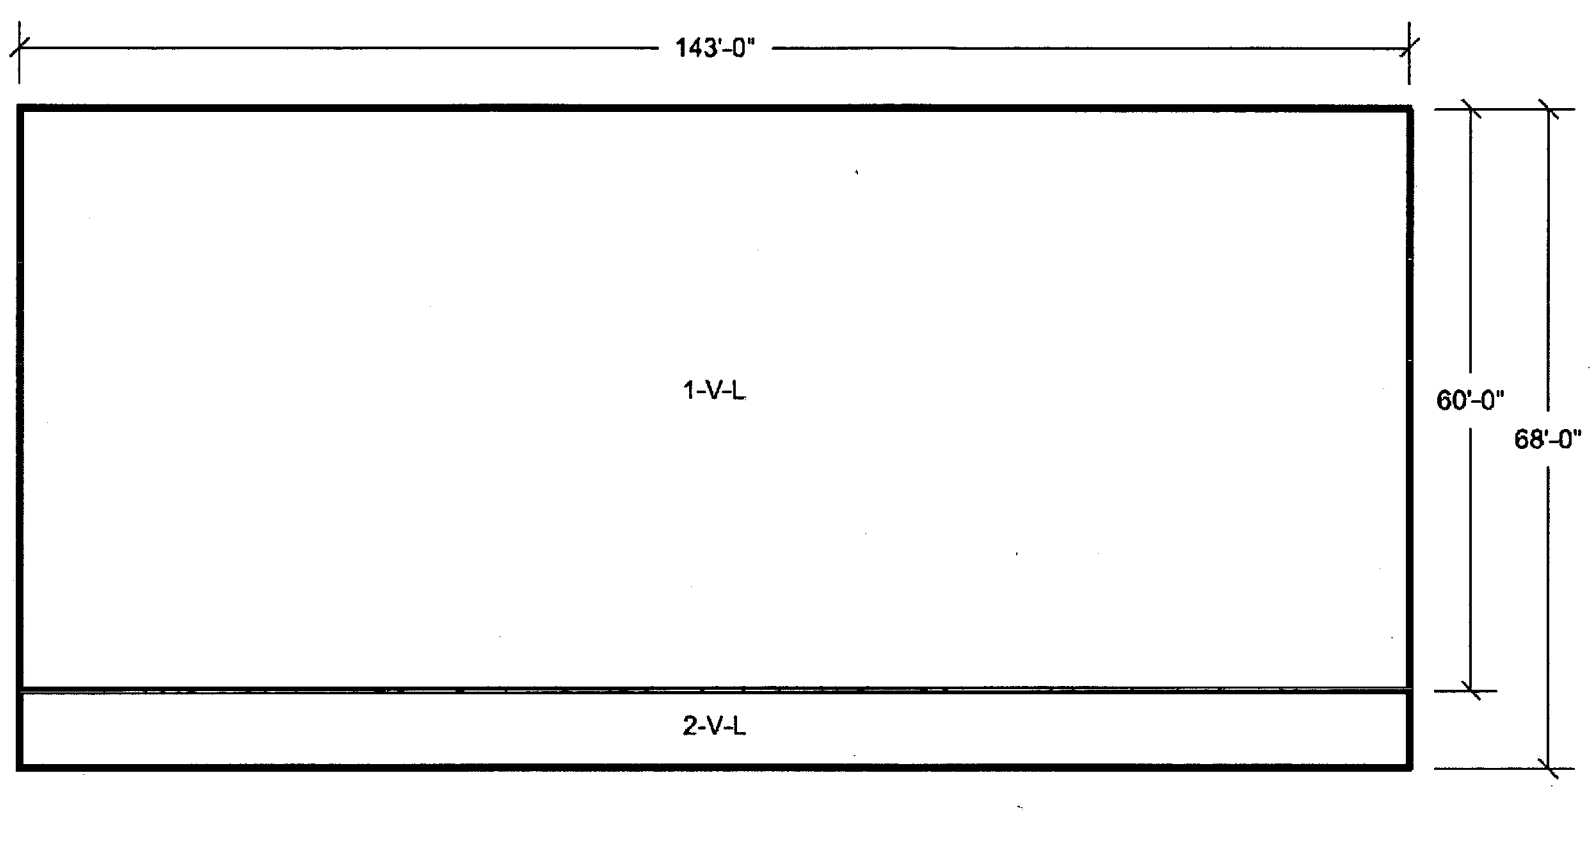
H.6-52 ~~Pumphouse~~ Pump House North Wall Looking South
